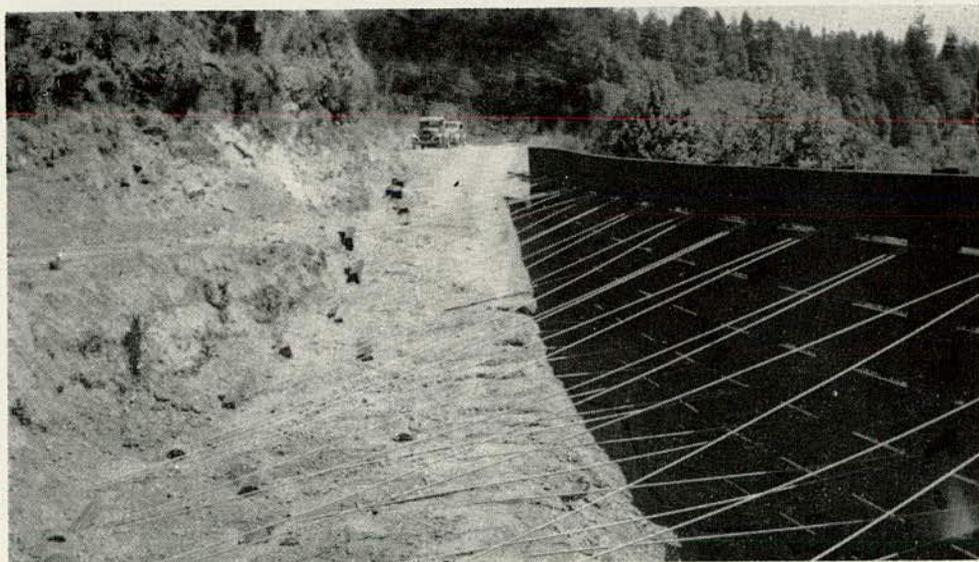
Timber retaining wall with tie-rods. Unstable foundation precluded use of conventional retaining wall. Lateral support provided by steel cables anchored to deadmen in firm material in slope above the wall. Embankment constructed above this wall near Guerneville, Calif., has been stable since construction in 1939. (Courtesy of California Division of Highways)
